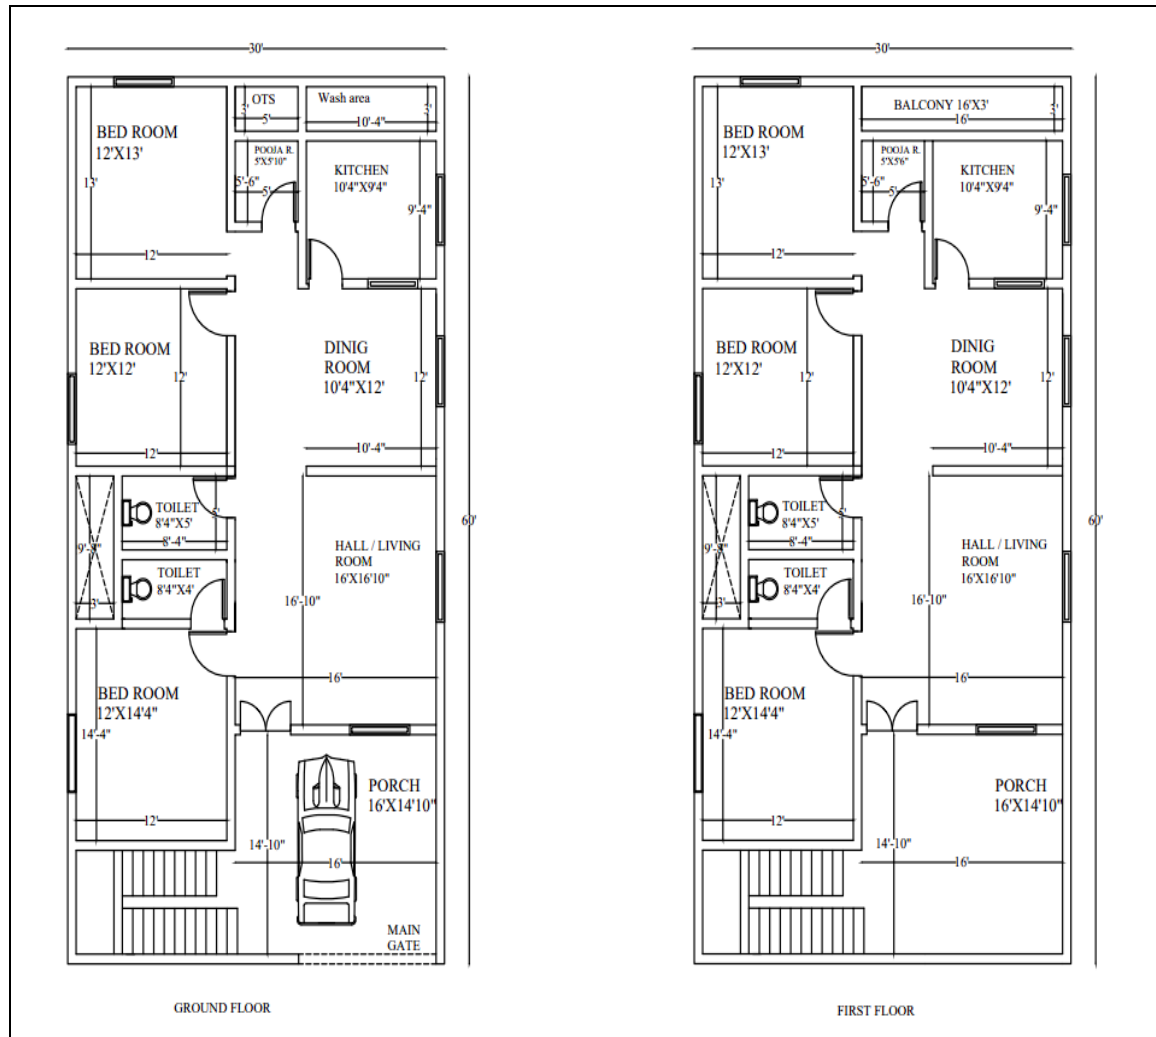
Example architectural drawing: floor plan and elevations of a multistorey building.
